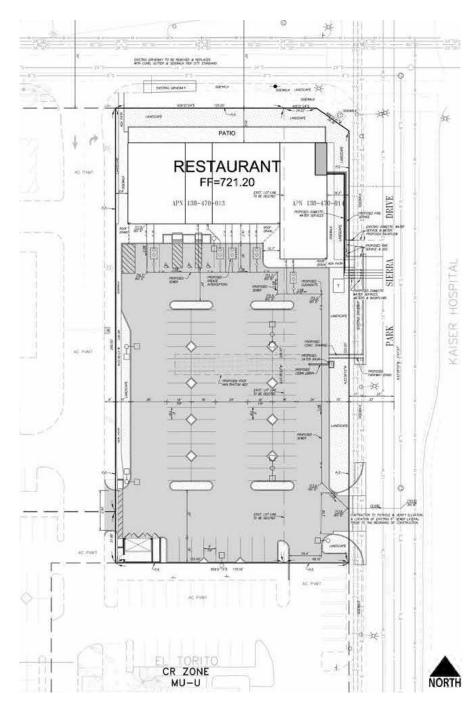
Project Plans (Conceptual Utility Plan)
